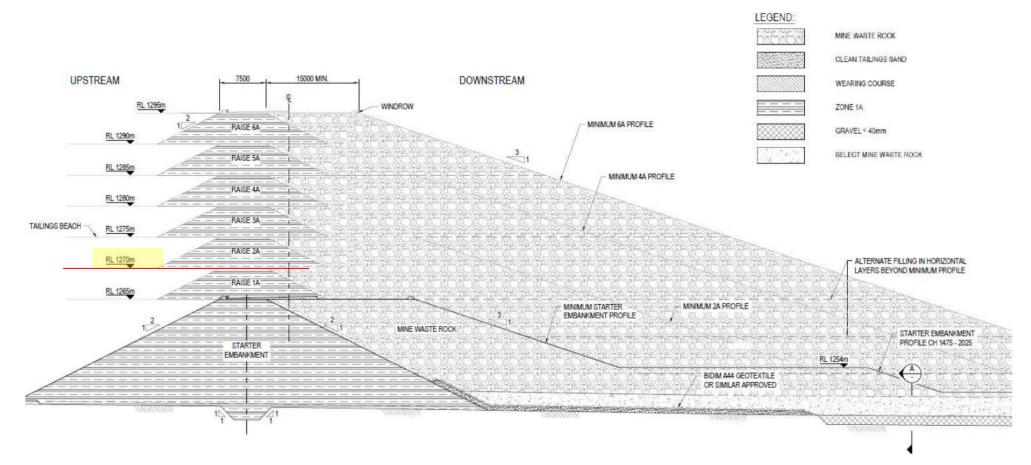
Typical cross-section of TSF4 perimeter embankment (GHD 2021) – raise to 270 m AHD / 1270 m RL requested for this approval.
